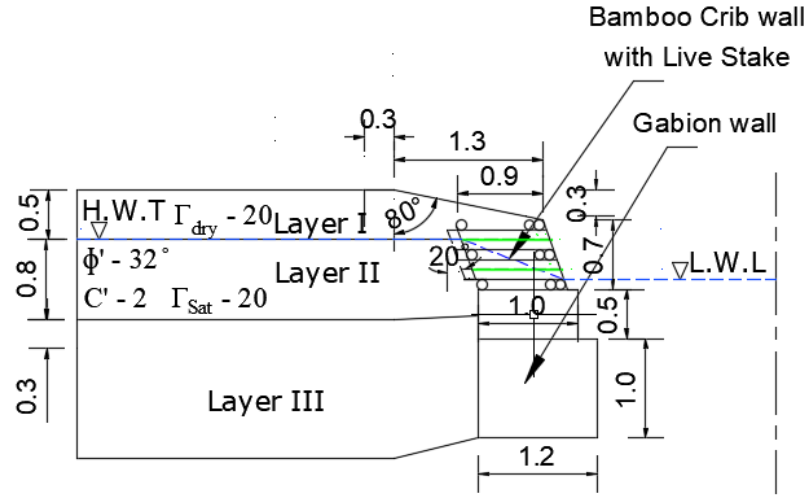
Proposed idealized section of Bamboo Crib wall
